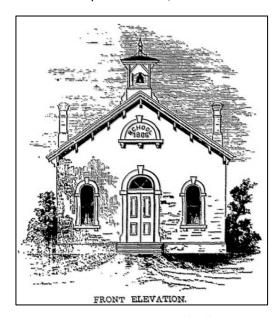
Prospective one-room schoolhouse design (*The Canada Farmer*, Vol. 3, no. 12, p.189)
